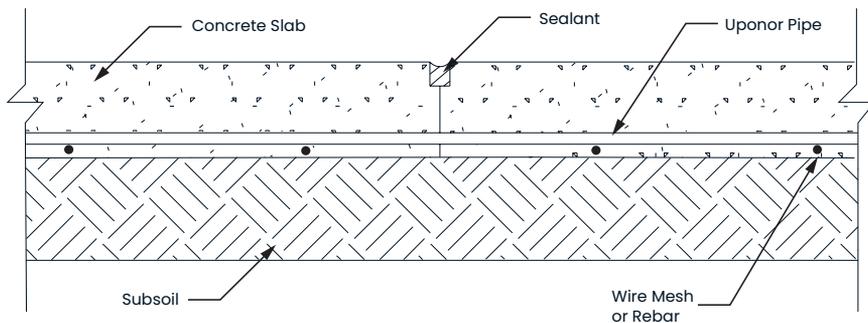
Control joint – Sawed or formed (allows concrete to crack in a predictable pattern)
